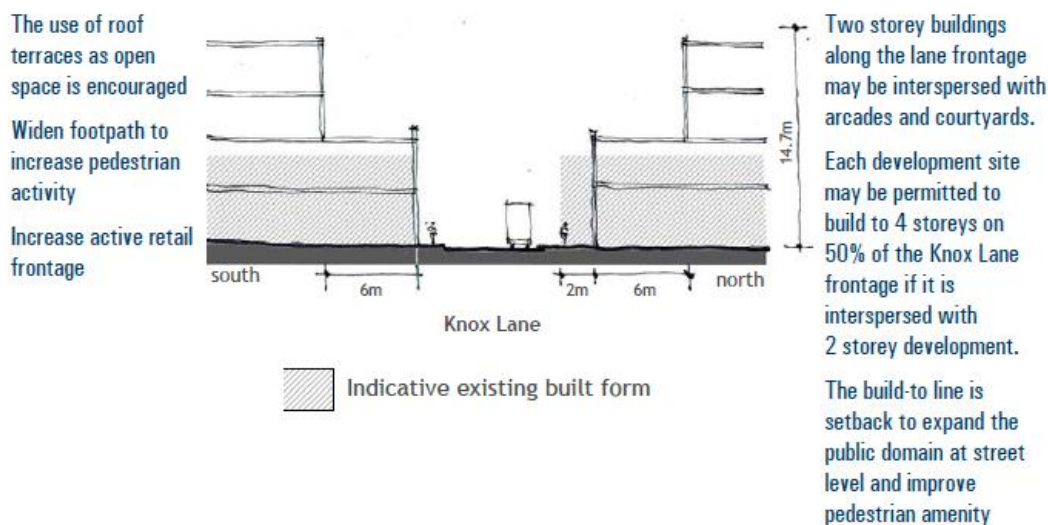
Cross Section through Knox Lane- Figure D5.4.9 in Woollahra Development Control Plan.
